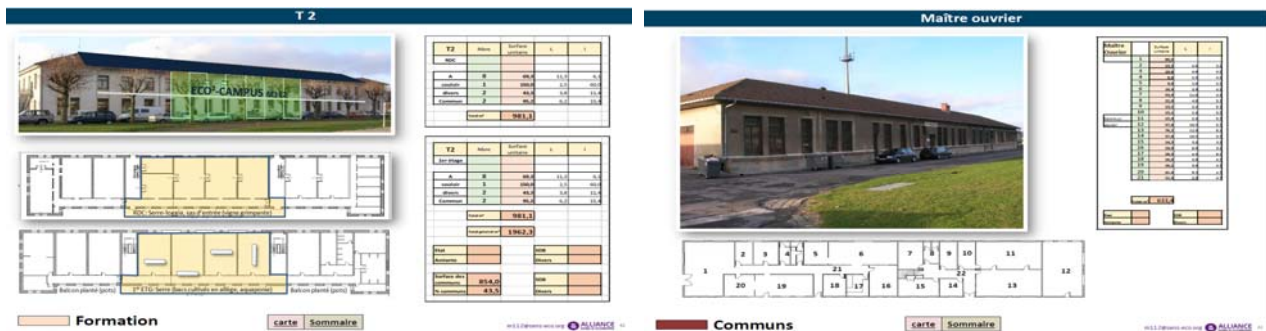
Floor plans and designs of the Microville 112 buildings under renovation
